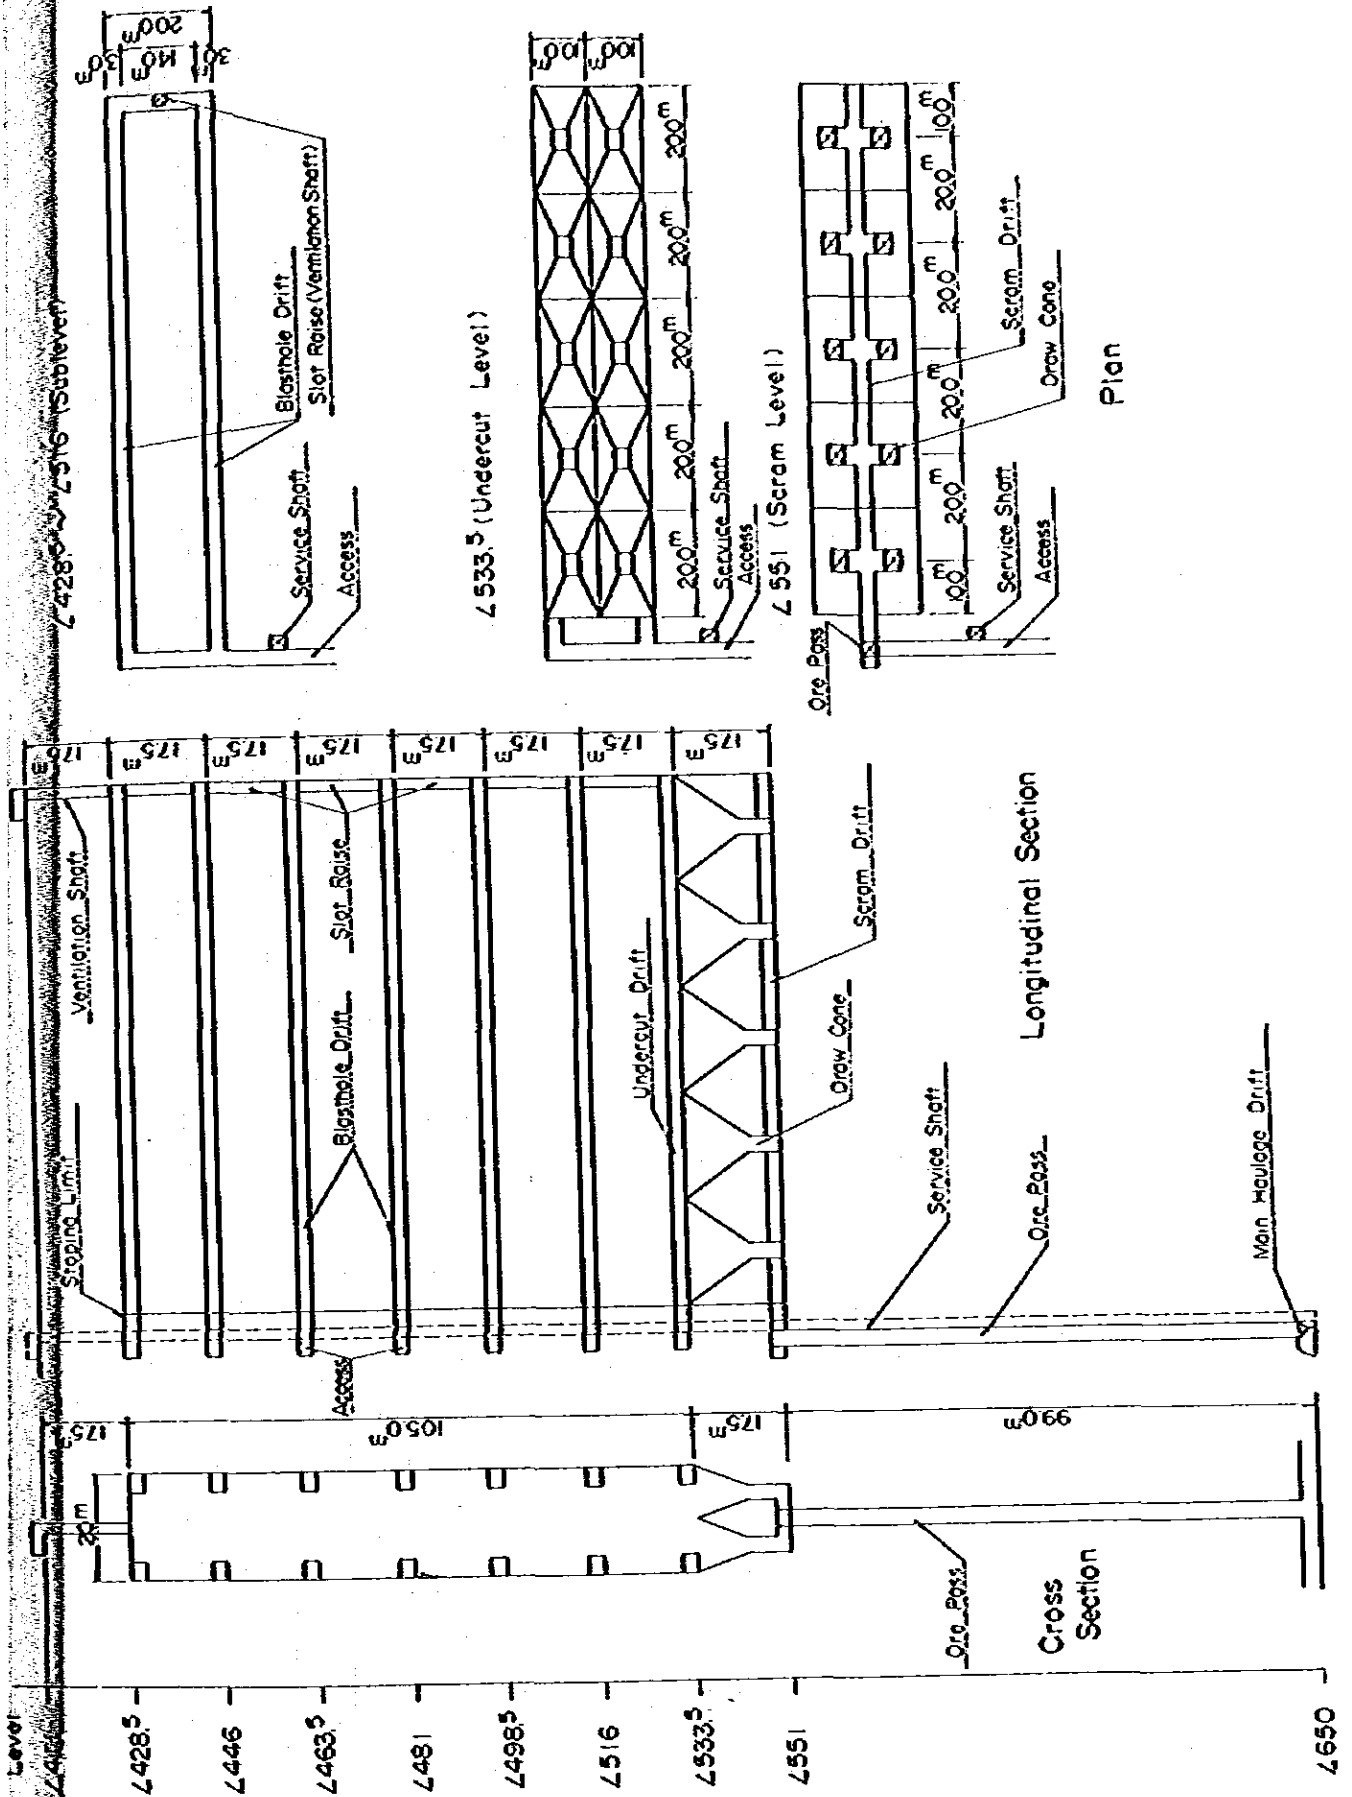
Plan and Section of Typical Sublevel Stopes
